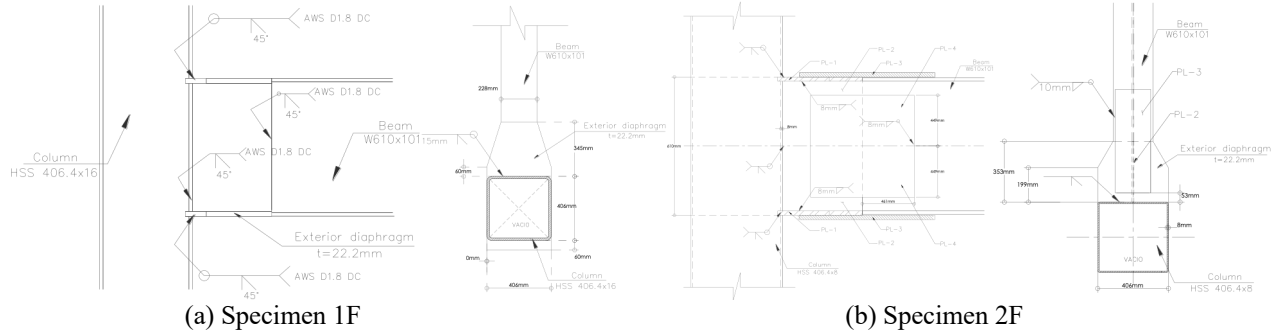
Specimens 1F and 2F with flush exterior plate connections
